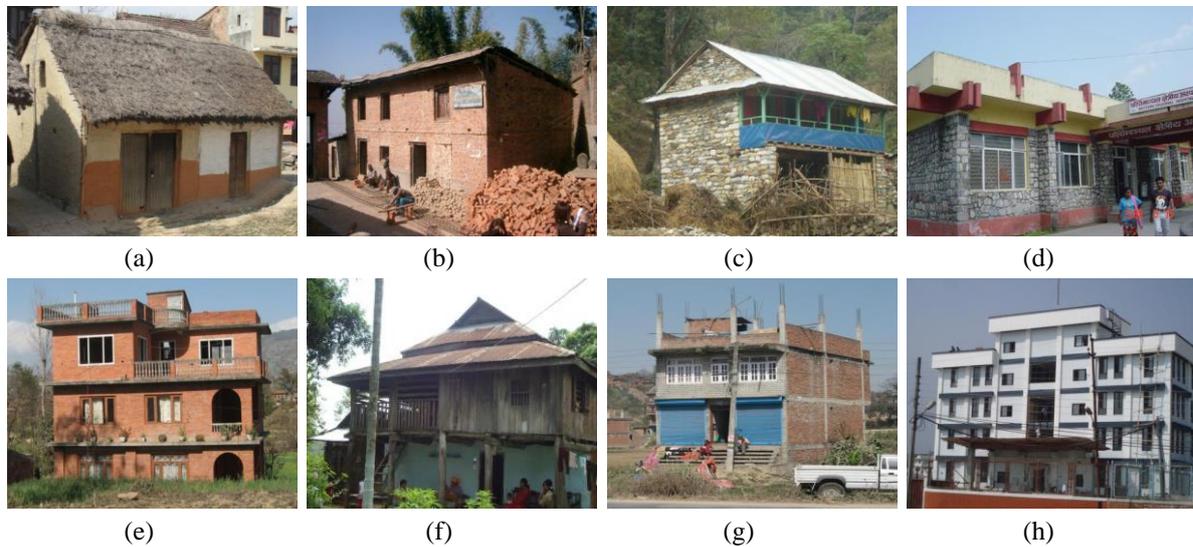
Existing building typologies in Nepal: (a) Adobe, (b) Brick in mud mortar, (c) stone in mud mortar, (d) Brick in cement mortar, (e) Stone in cement mortar, (f) Wooden, (g) Non-engineered building, and (h) Engineered building
